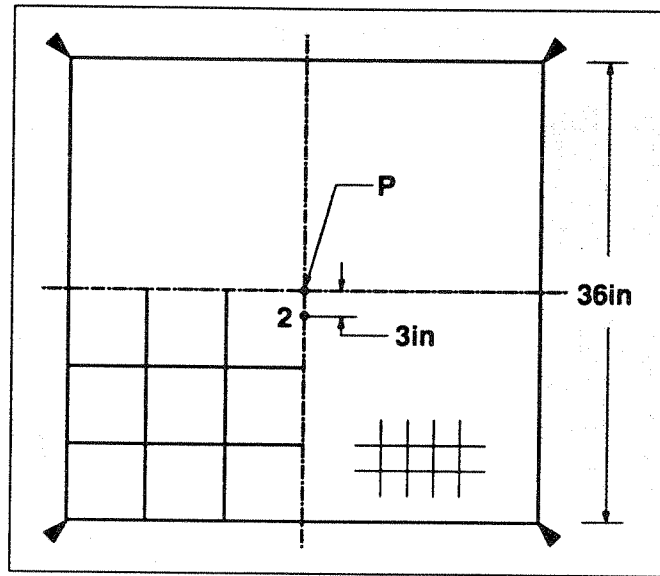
Configuration and Finite Element Discretization of Joffriet-McNeice Slab
